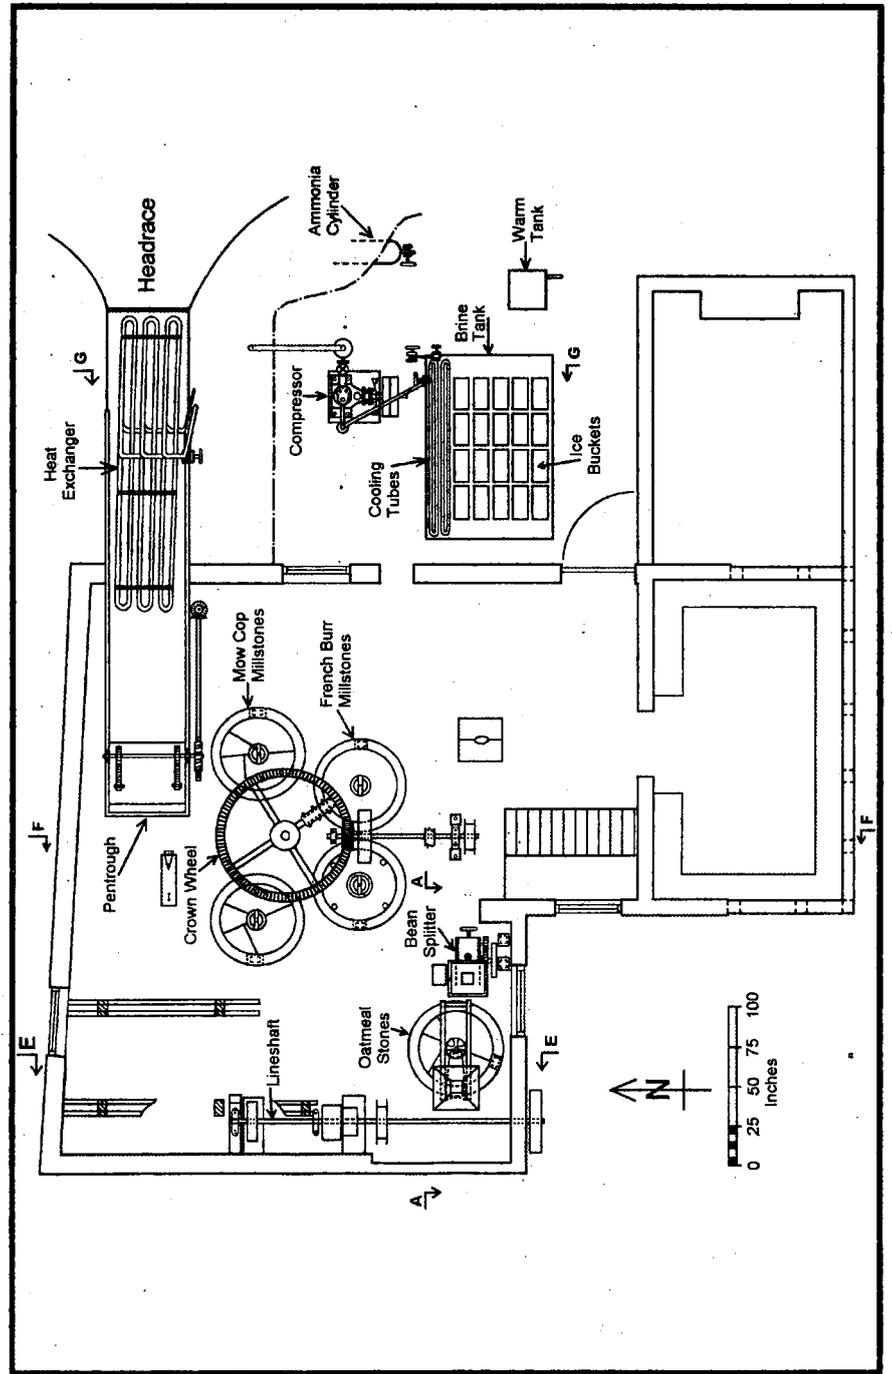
Plan view of the Stone Floor and ice-making equipment.
